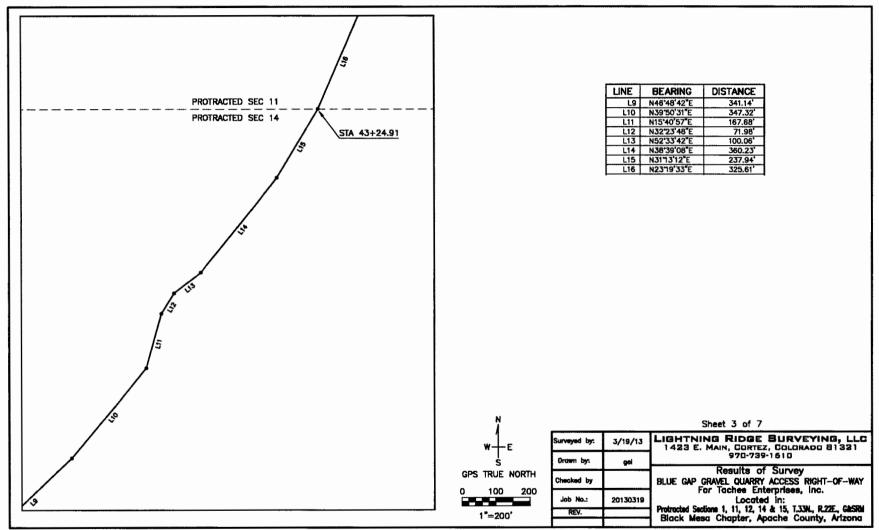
Proposed Access Road ROW plat (Page 2 of 6).
